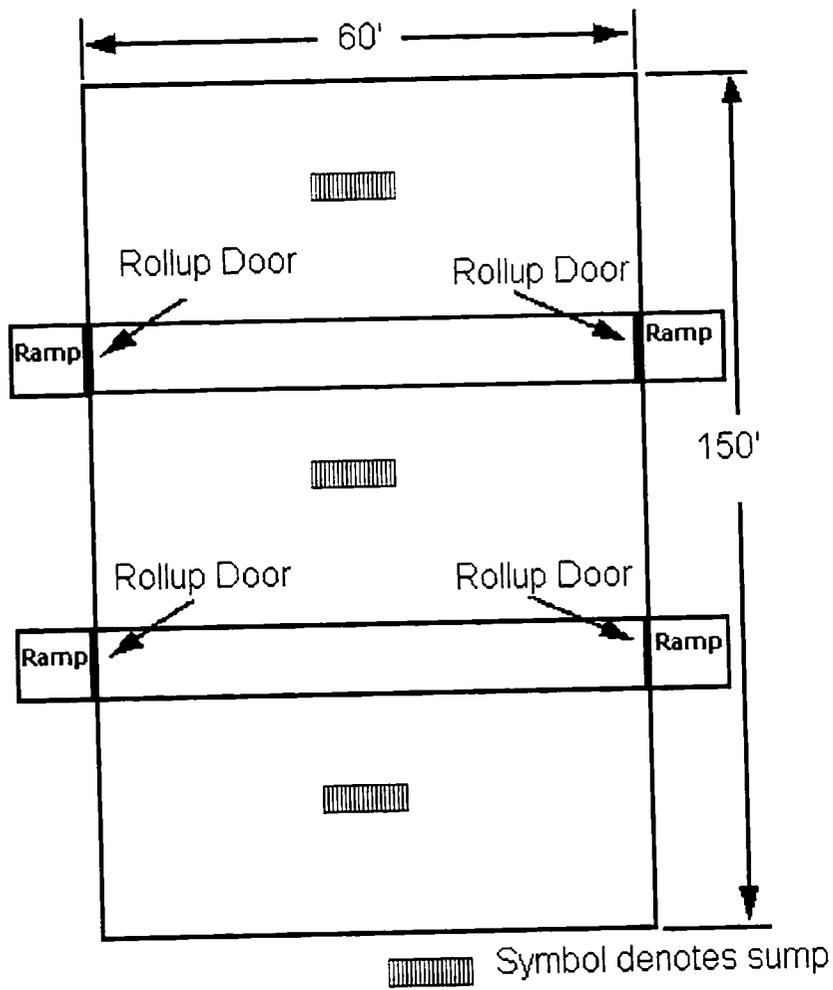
(Proposed) TRU Storage Facility, Building 7577.
